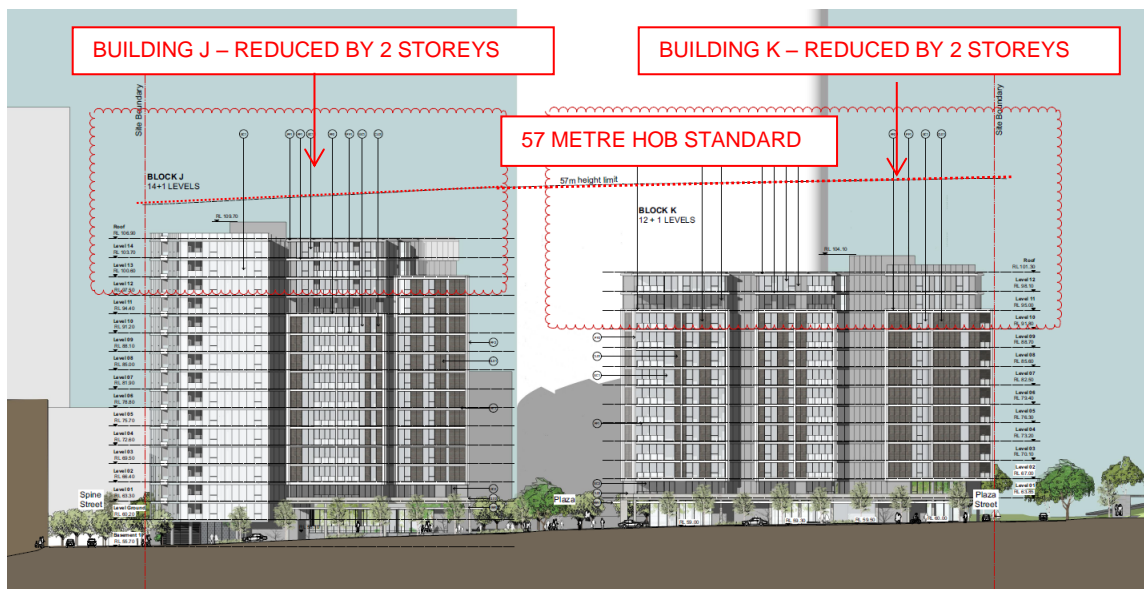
and 4 illustrates elevations Building M and K effected by the above amendments.
